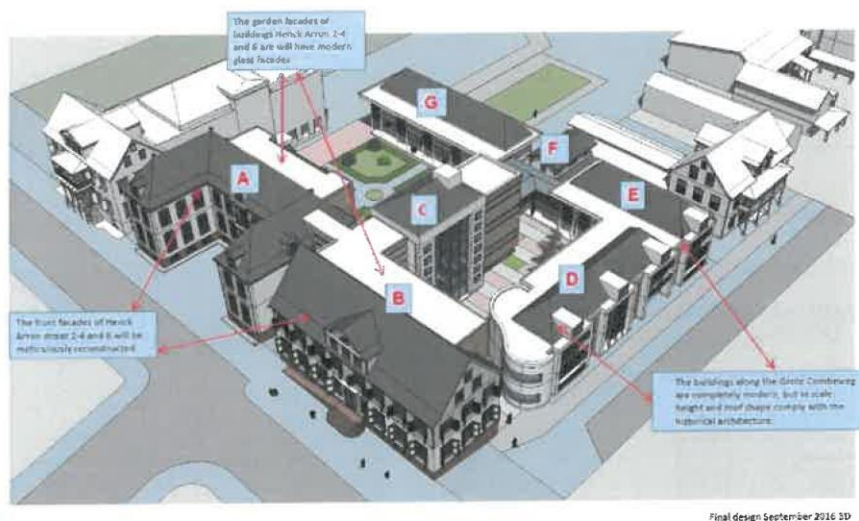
Building proposal (from: Dossier Final Design for the reconstruction of the former National Assembly buildings, MKDV Architects, May 8, 2017).
